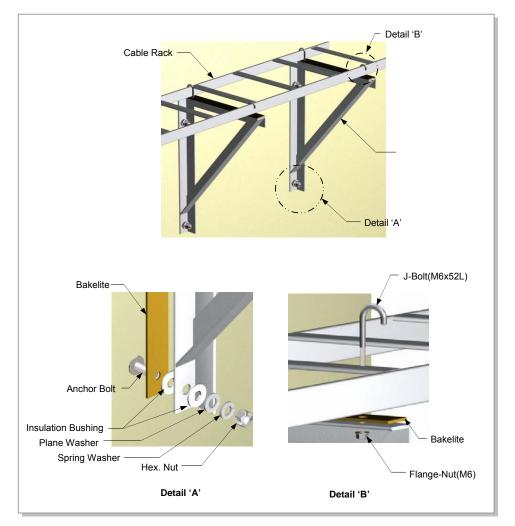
Installing Cable Rack Using Triangle Support Bracket
